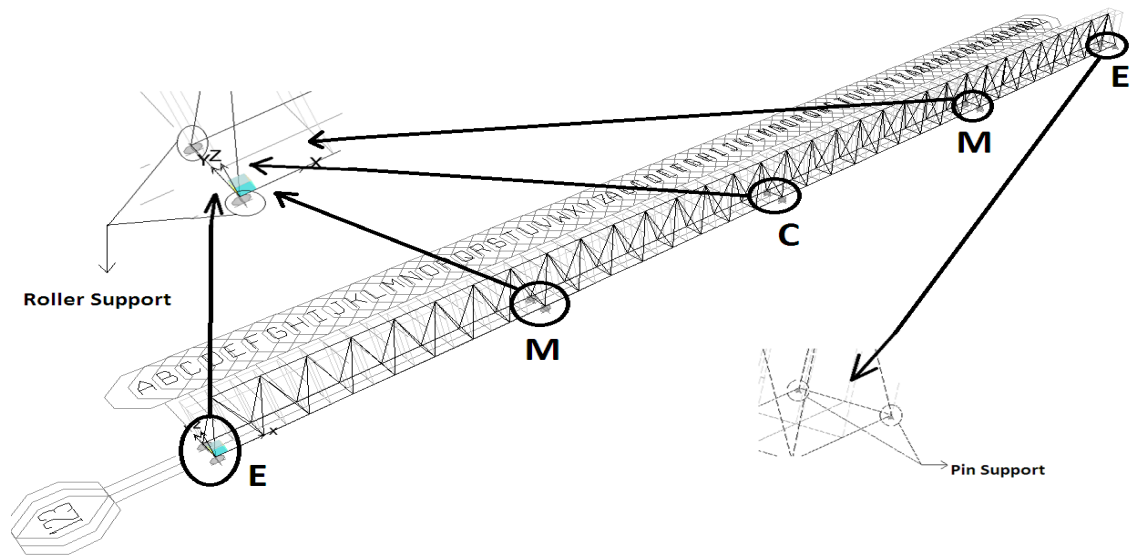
Precast joist supported at the ends by the Girder and with three temporary intermediate supports
